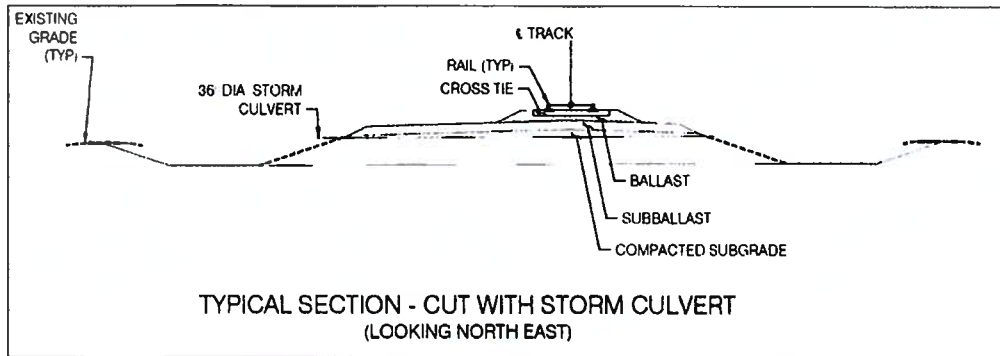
Typical cross section, looking straight along the rail, for rail corridor areas including storm culverts.
